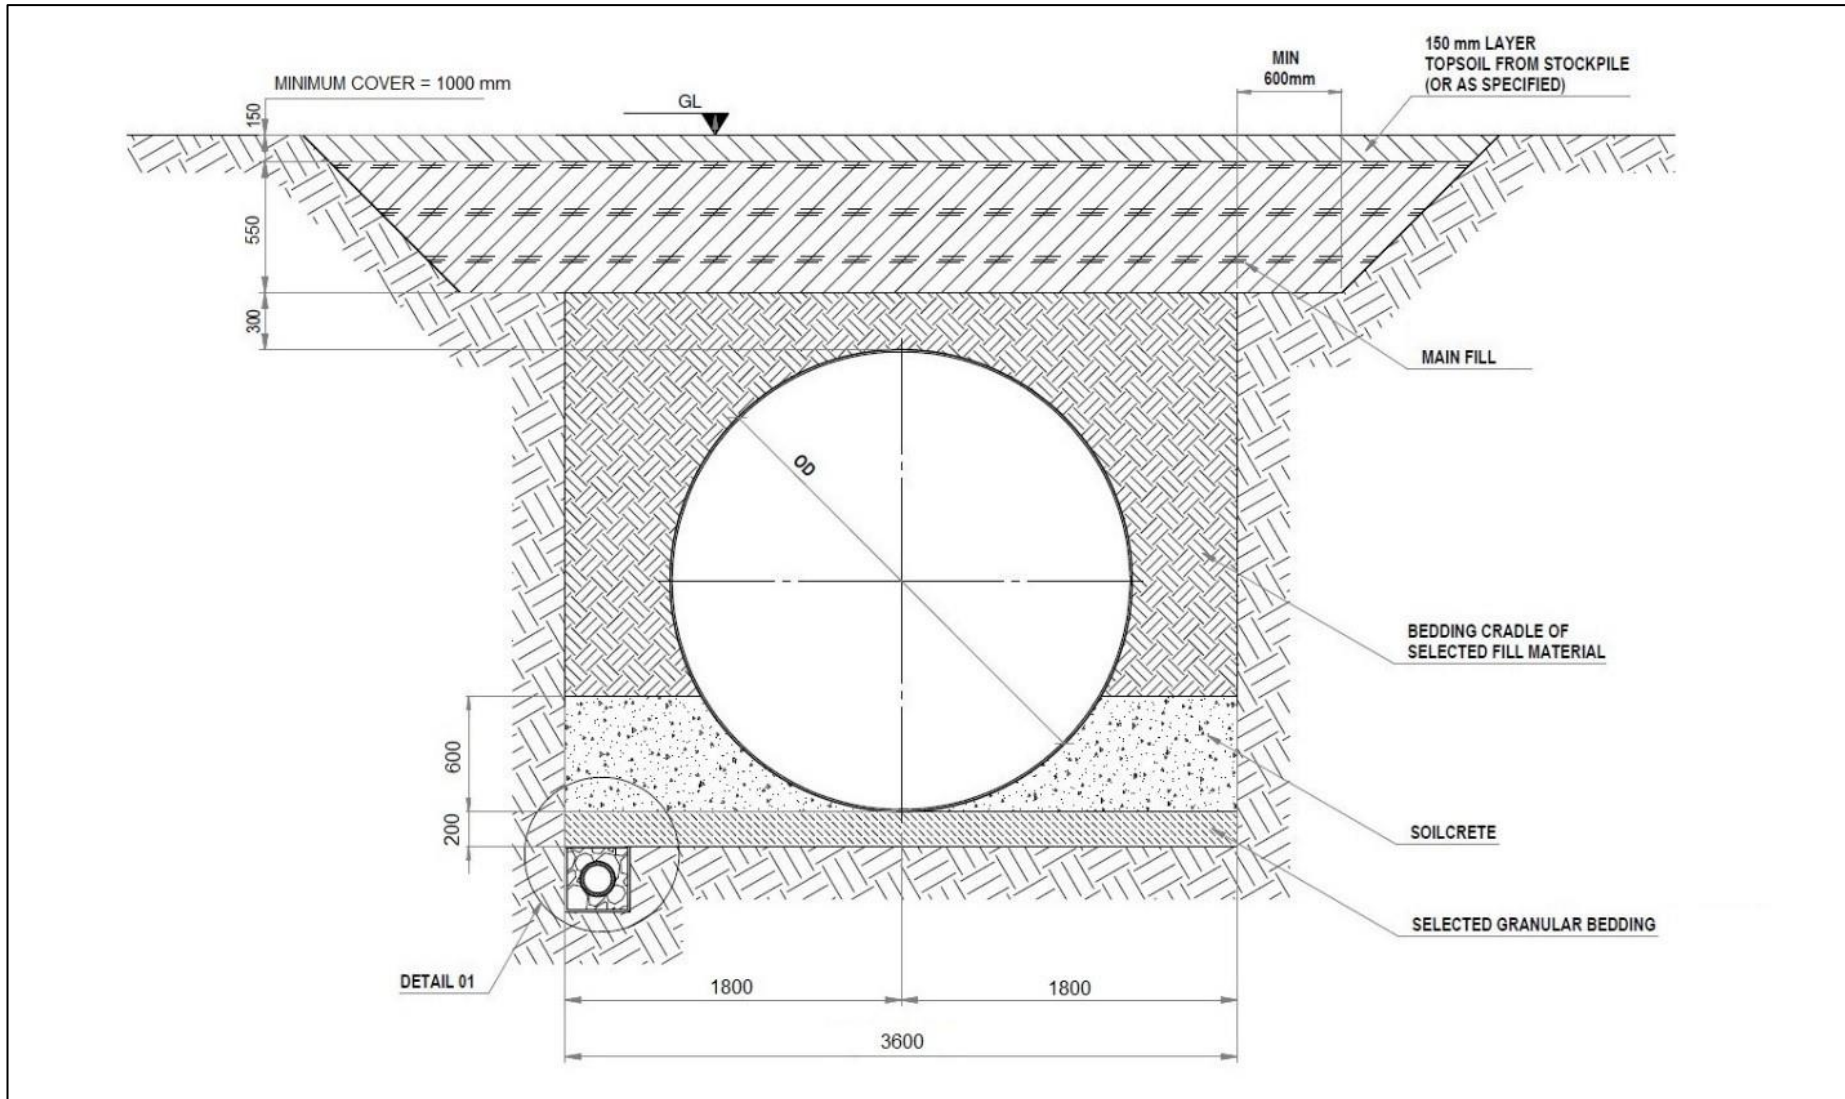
Typical cross section of Siphon 1 – underground portion of pipe installation
